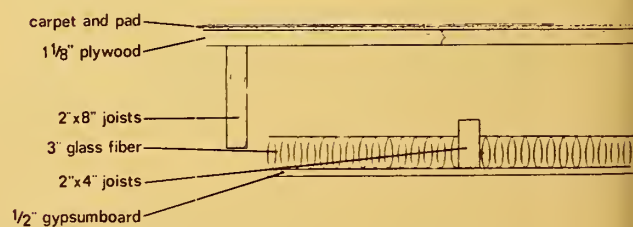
Floor-ceiling assemblies with separate floor and ceiling joists.
